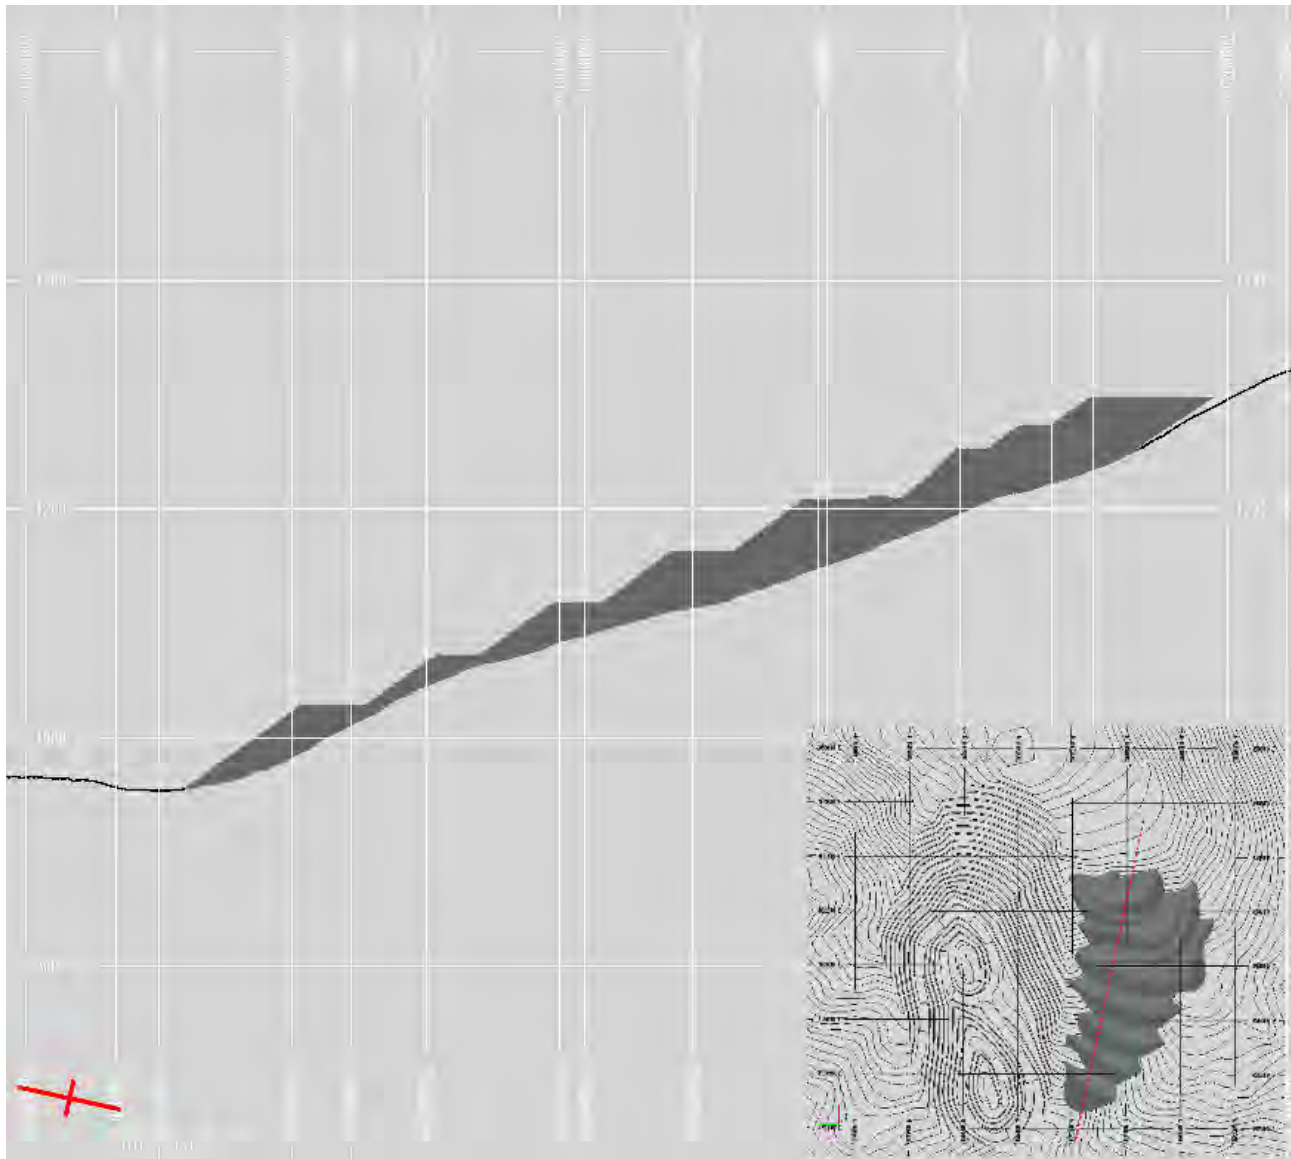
Sectional View of the Platinum Gulch Waste Rock Storage Area at Full Build-Out
